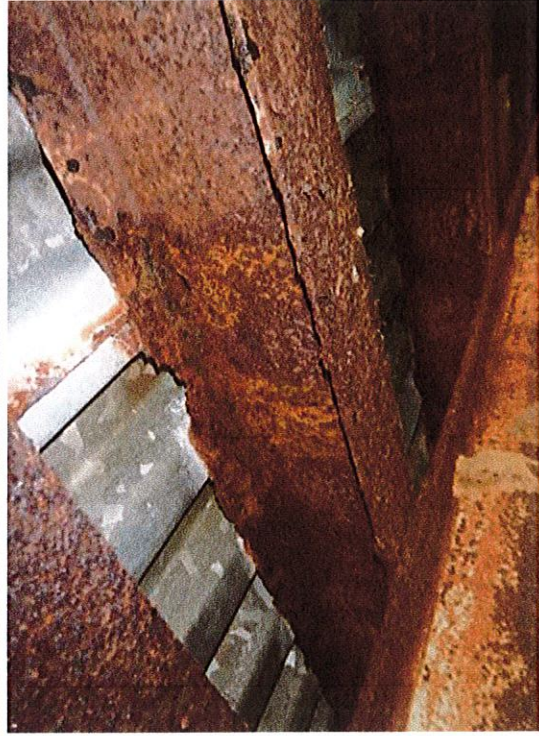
SPAN 6, PANEL 1, STRINGER 3: 80% section loss to top flange just south of Floor Beam 1
